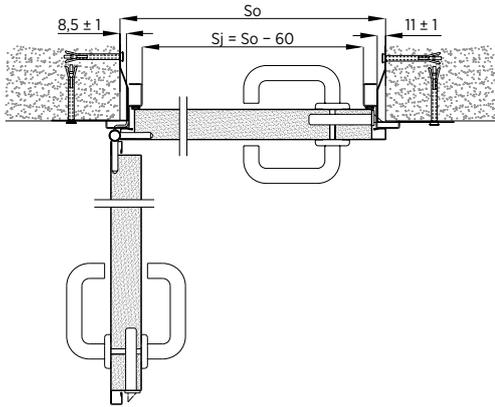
Installation of the single-leaf door with the corner frame, horizontal cross-section
